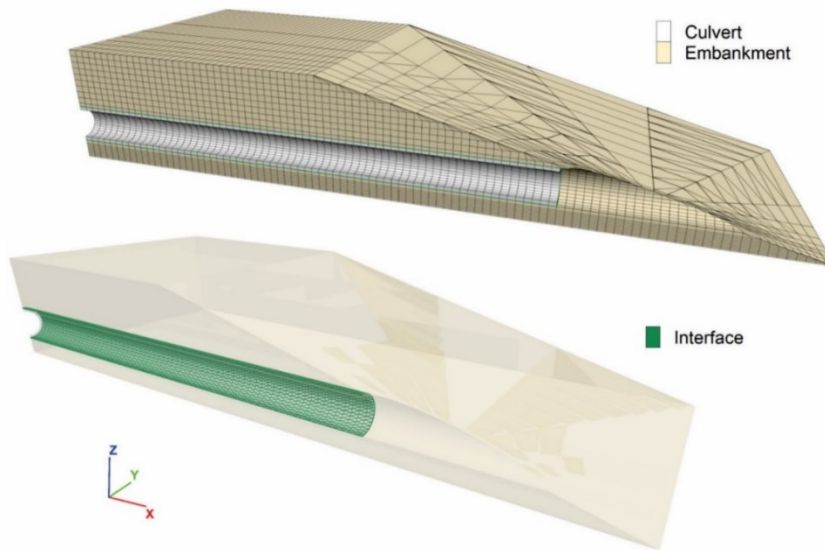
FLAC3D meshes showing embankment, culvert, and soil-concrete interface
